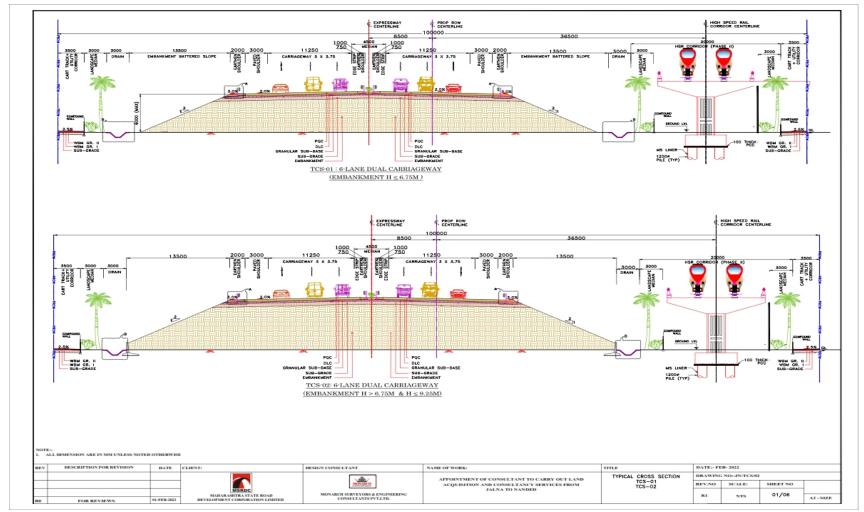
A: (Typ.) Cross Section of Proposed Alignment
